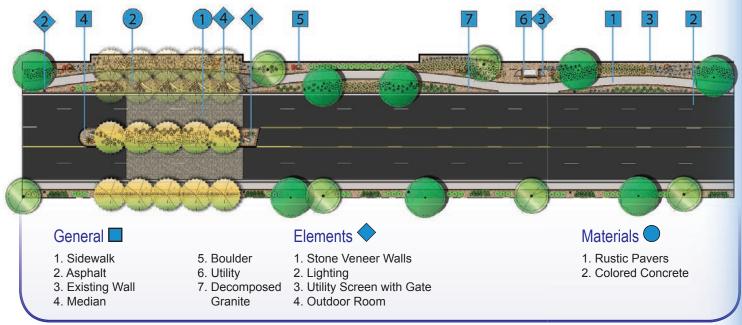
Representative "Better" Resort Living Streetscape Plan
